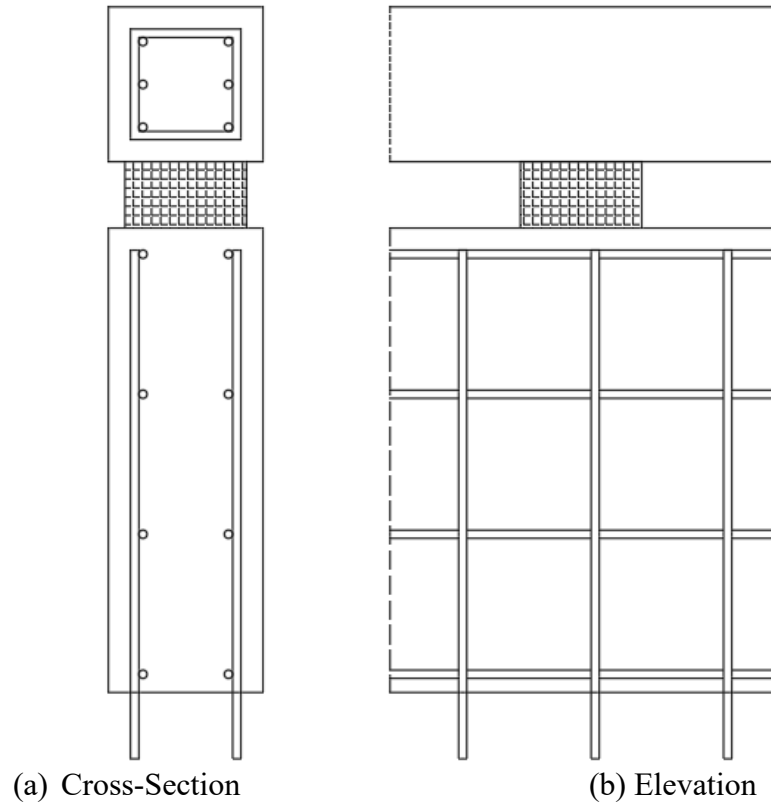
Concept 3 – Rigid Wall and Absorbing Concrete Rail
